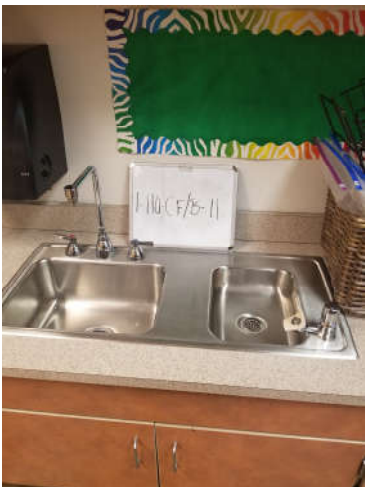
Classroom faucet, located on the 1st floor in room 110.
